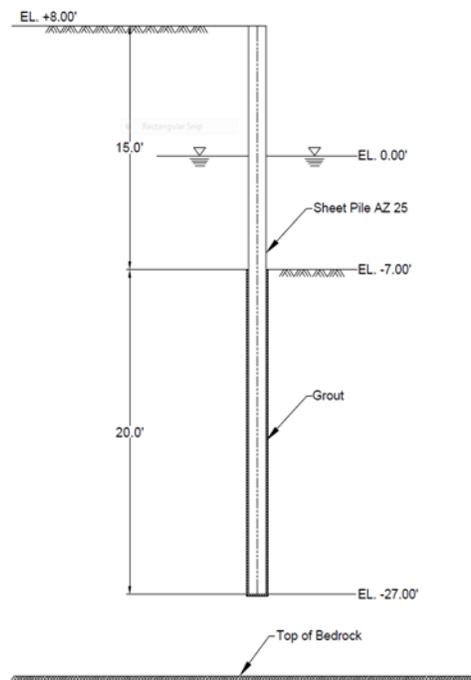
Cross-section of 15 feet Cantilever Sheet Pile Wall for Soil Area 2
